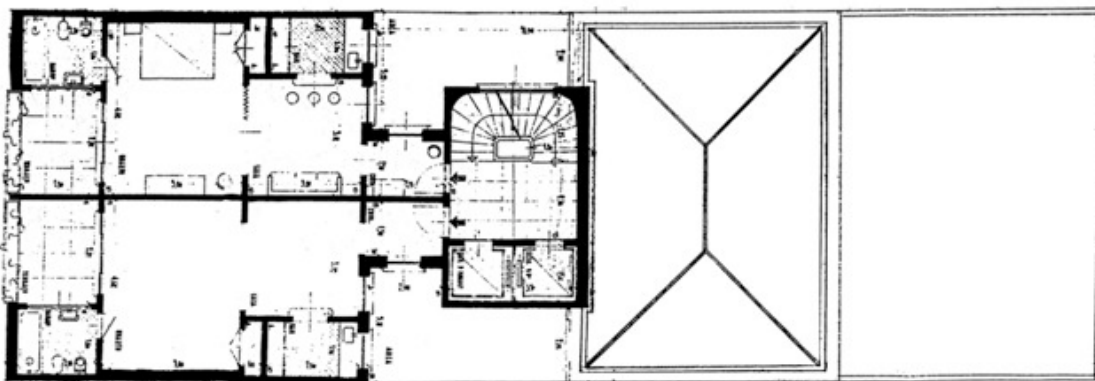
Apartment floor plan of a building designed by Jacques Pilon in 1941 (Source: FAU-USP archives. In APARTAMENTOS database – Nomads.usp).
